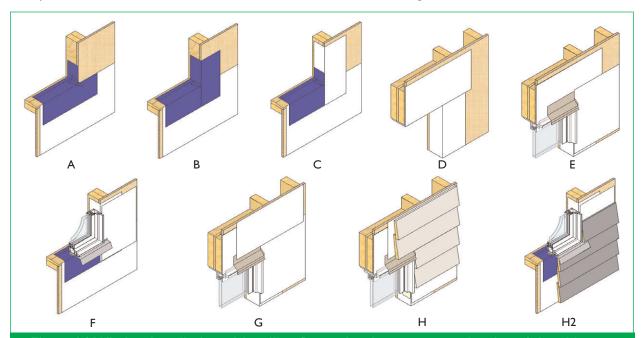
Window installation with nailing flange showing proper overlapping of sheathing paper and flashing (from Water Penetration Resistance of Windows.)
